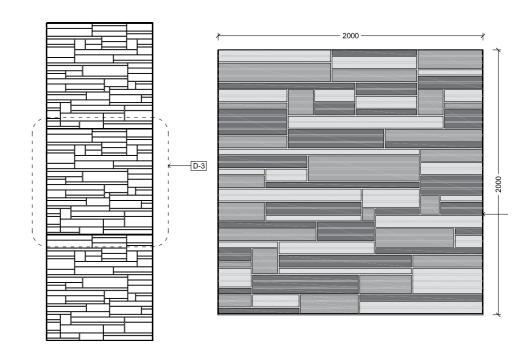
RETAINING WALL DETAIL FACING RESIDENTIAL CONTEXT
